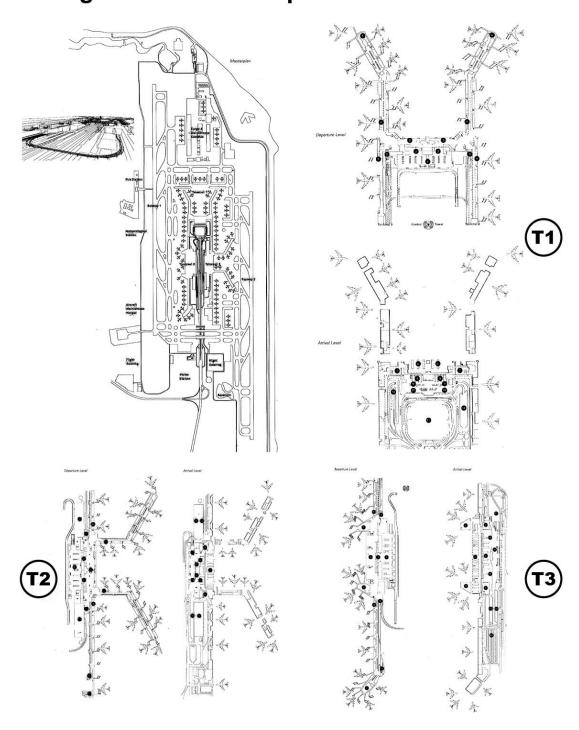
Plan View of: Site, Terminal 1, Terminal 2, and Terminal 3.214
